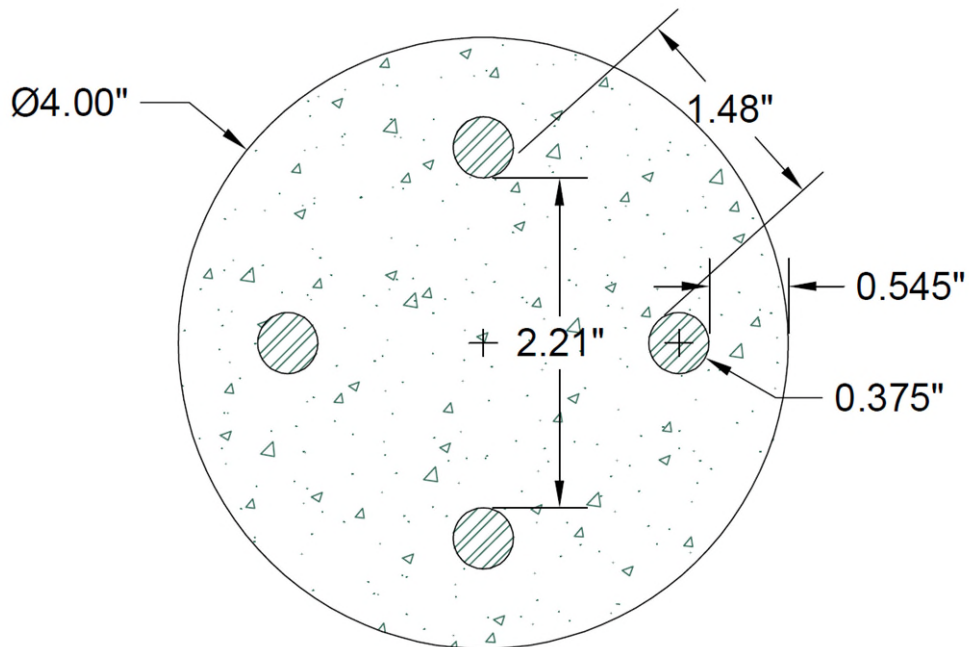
Cross section of RC specimens with four #3 longitudinal bars inside.
